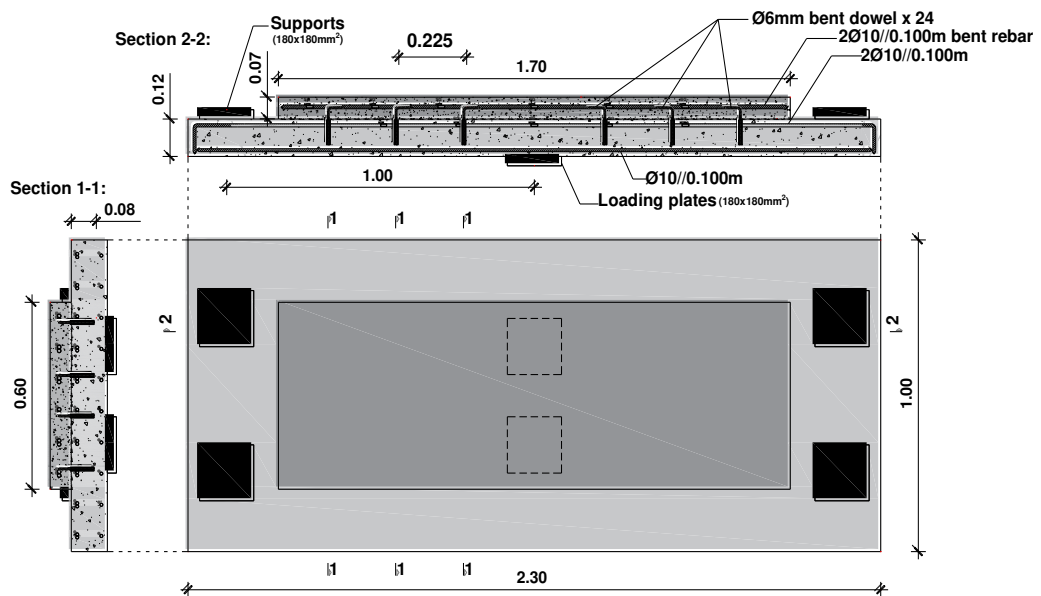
Rebar detailing and strain gauge placing for R<sub>L</sub>-STC specimens.
